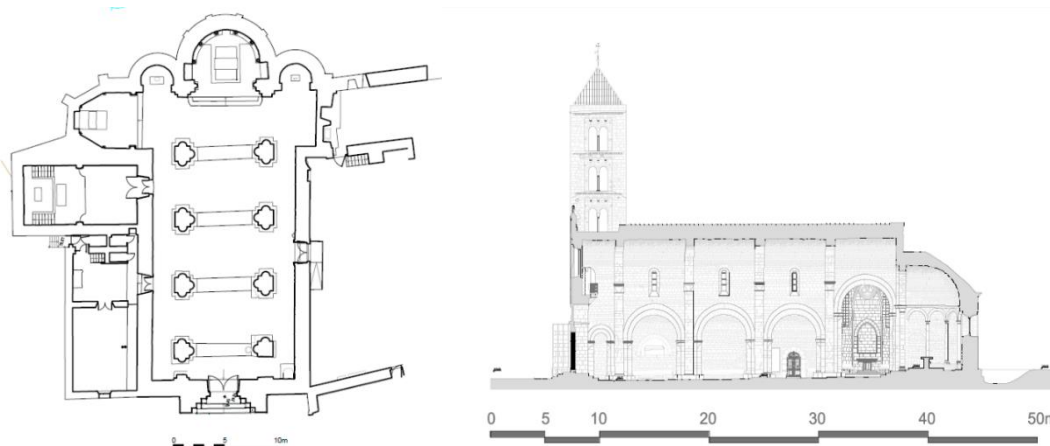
Plan and elevation of the church of Santa Maria de Vilabertran
